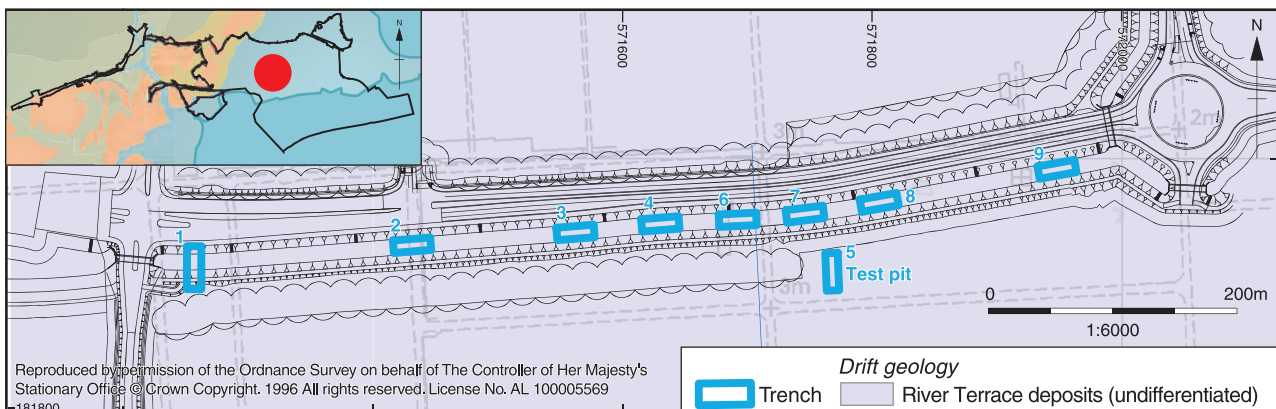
Trench location plan, Logistics Park Infrastructure
